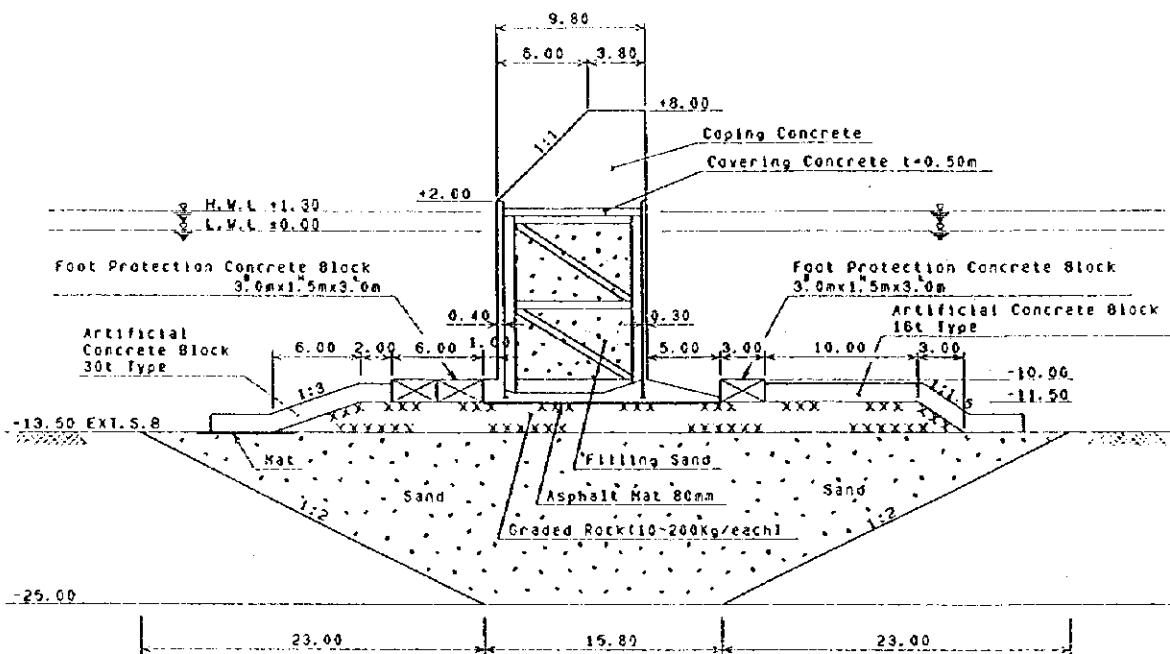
(2) Typical Cross Section of Breakwater (Hybrid Caisson)
